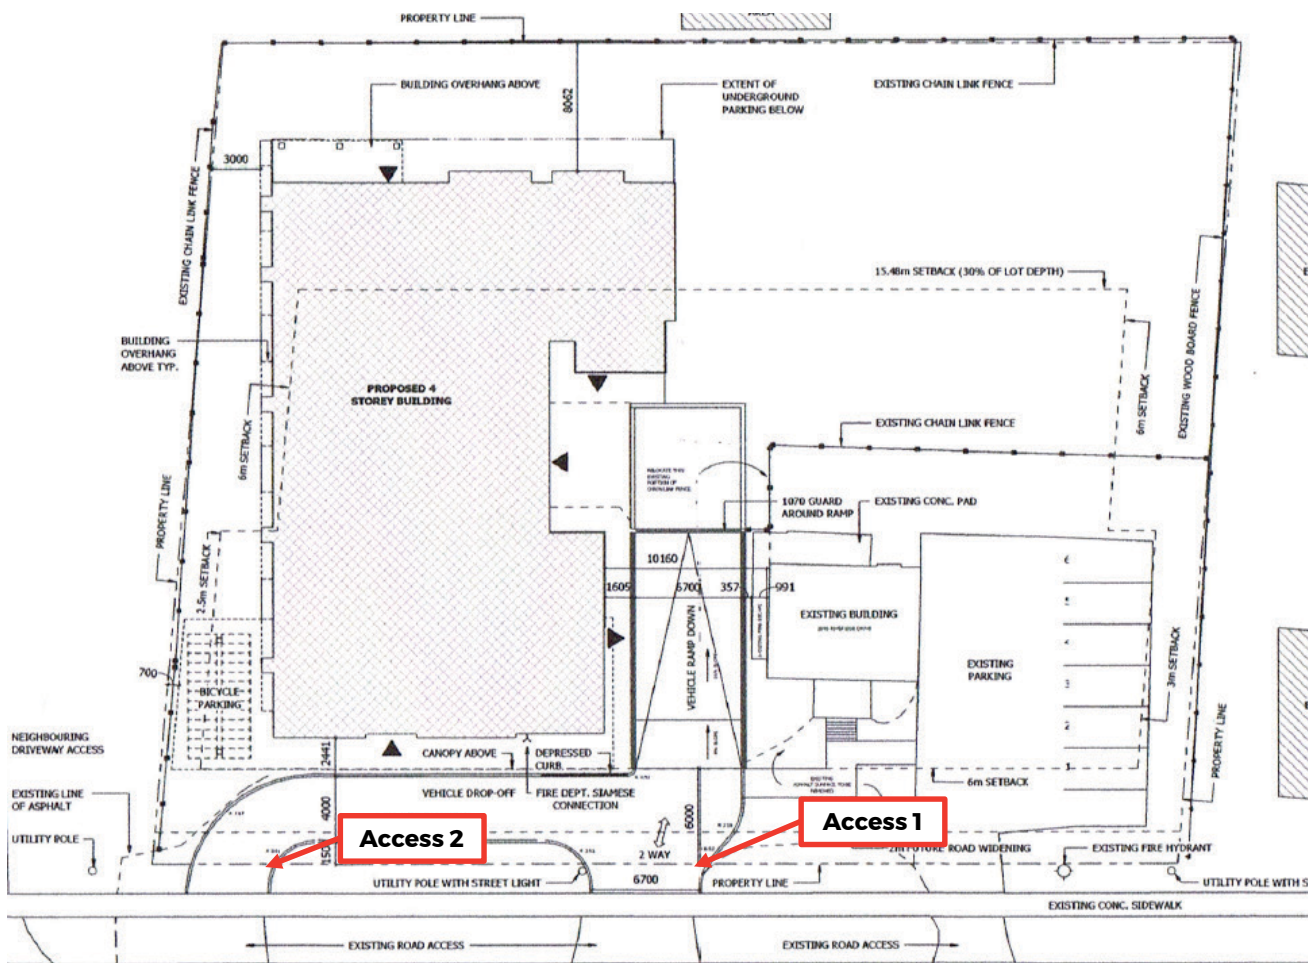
Site Plan (Prepared by Vandenberg & Wildeboer Architects)
